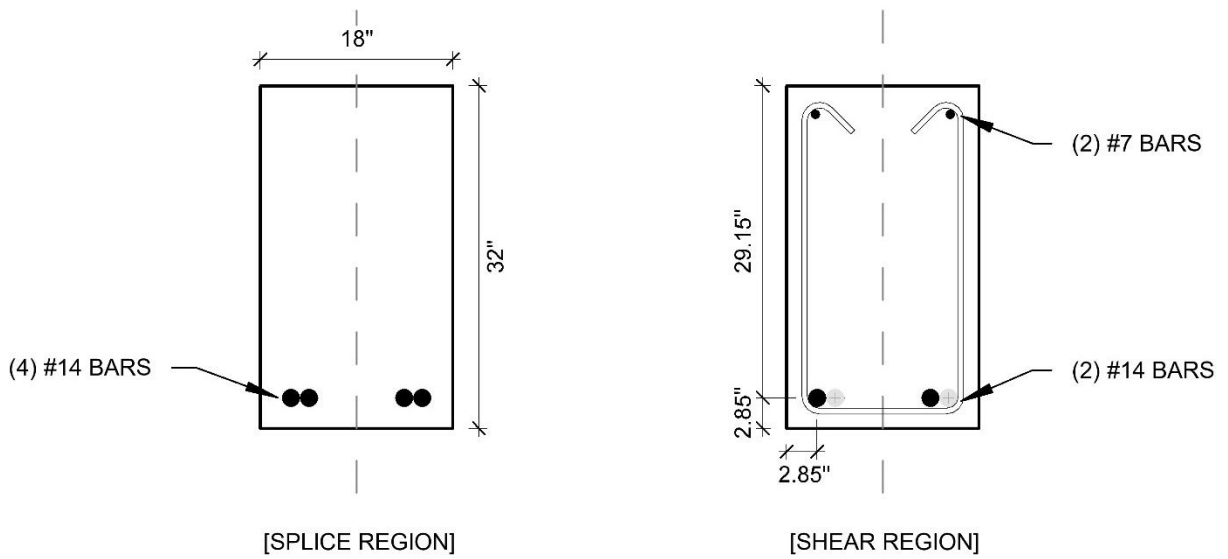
Cross section of 14-d (1 in. = 25.4 mm)
